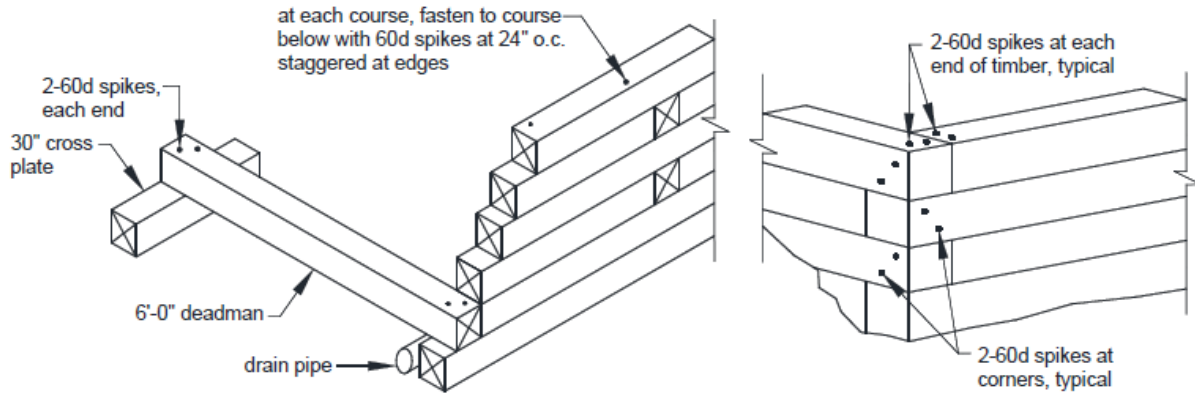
TYPICAL FASTENERS FOR TIMBER RETAINING WALLS
